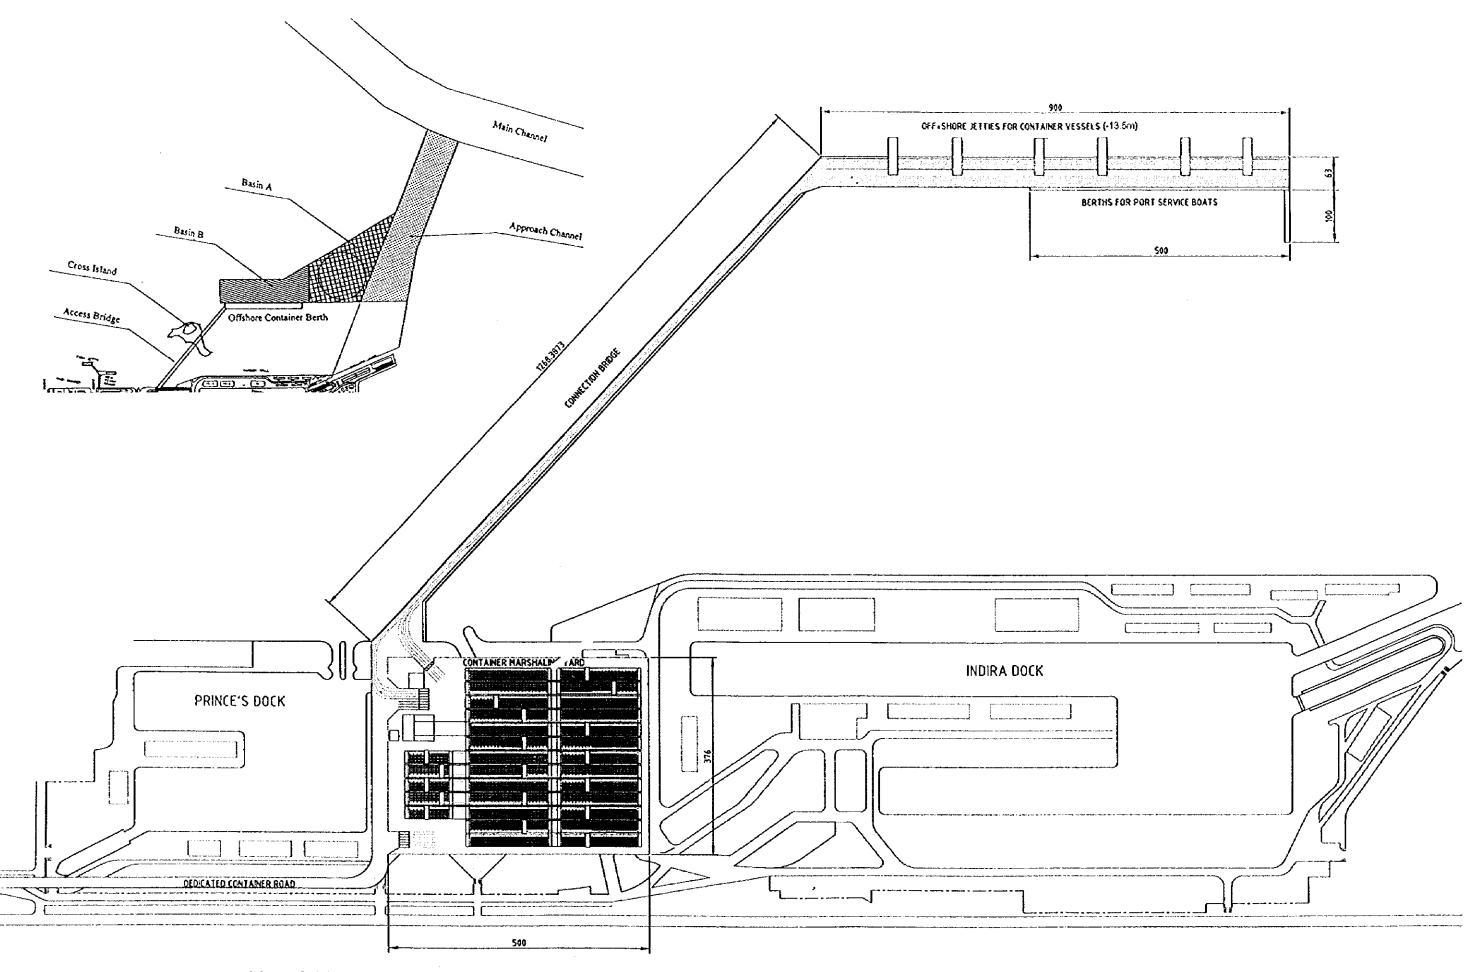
Layout Plan of A New Container Terminal at Victoria Dock (Alternative-6)
